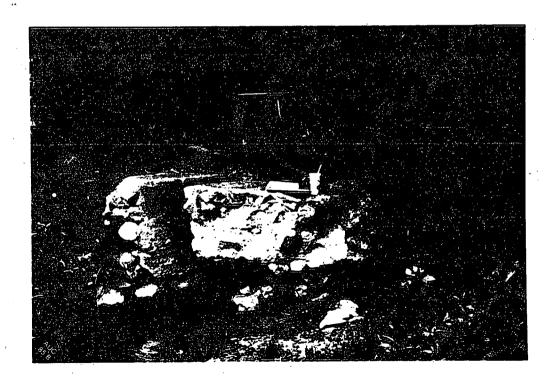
The northern portion of the old NRC Disposal Area (Building No. 12 on left-hand side, Building No. 11 in background, looking southeast).
